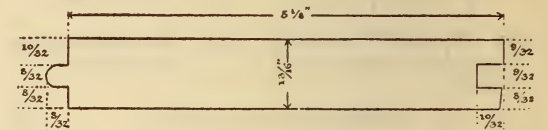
1 by 6 inch kiln-dried flooring, green, 5⅜-inch face
